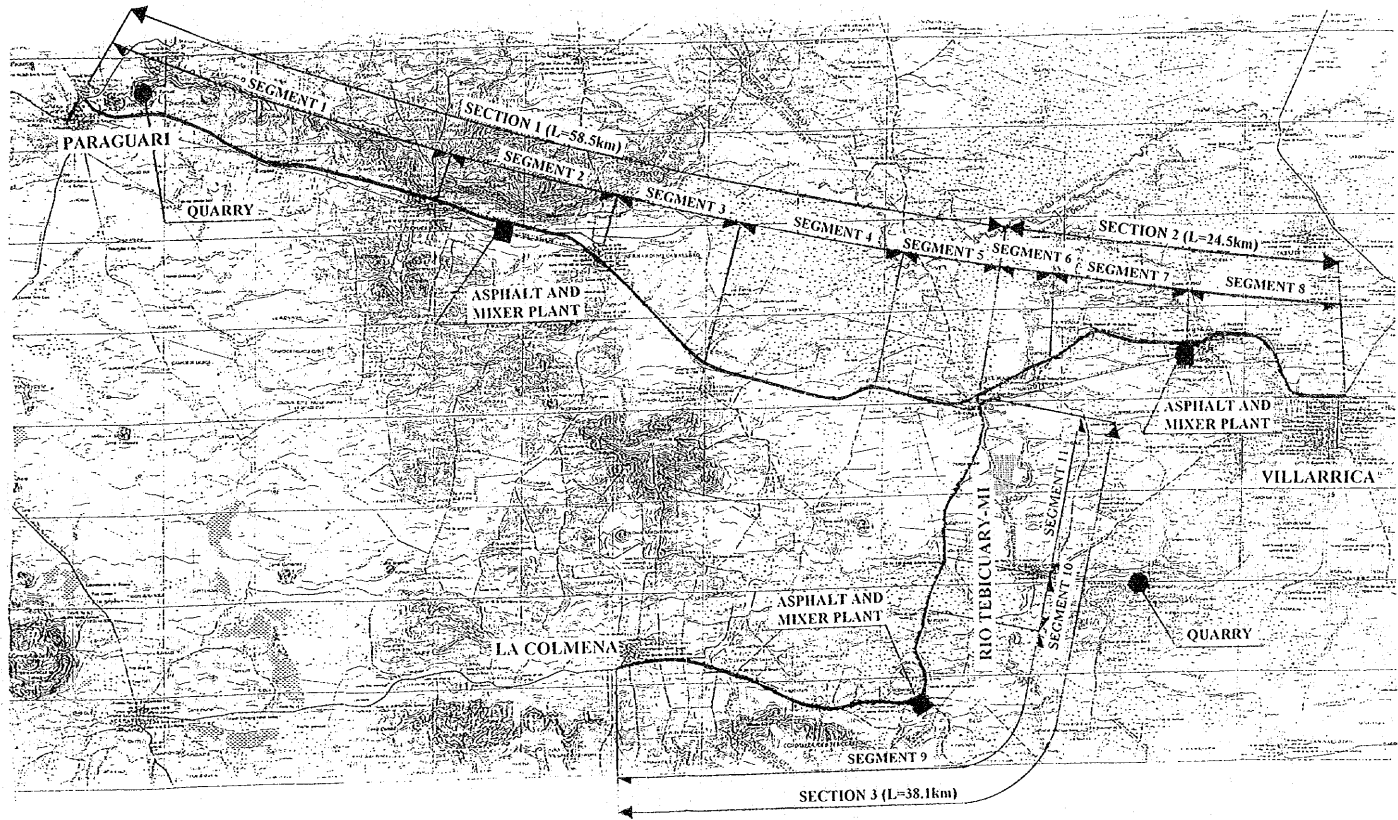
Division of Road into Section and Segment and Location of Quarry and Plant
